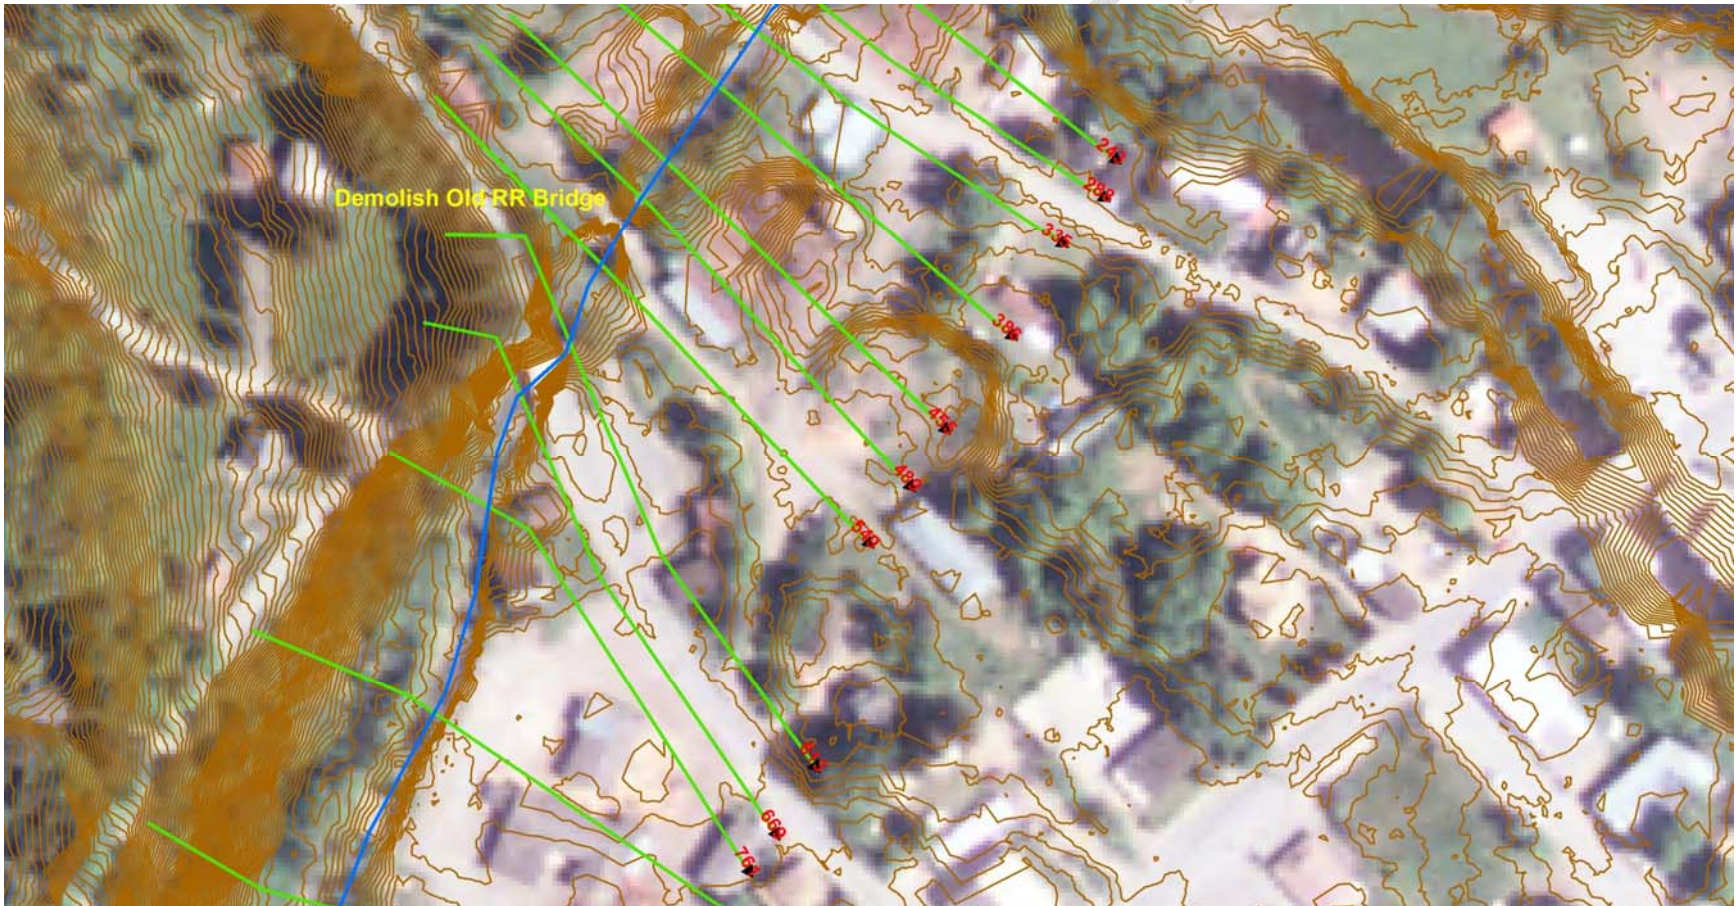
Conceptual Plan for Removing of Old Railroad Bridge
